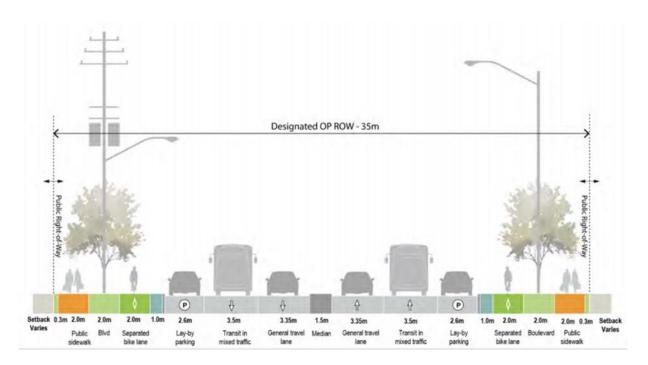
Preferred ROW Alternative (CN Railway Crossing to Clarkson Road South)
